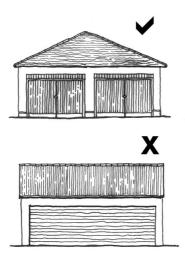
Double garages should be accessed by two separate doors divided by a pier.
